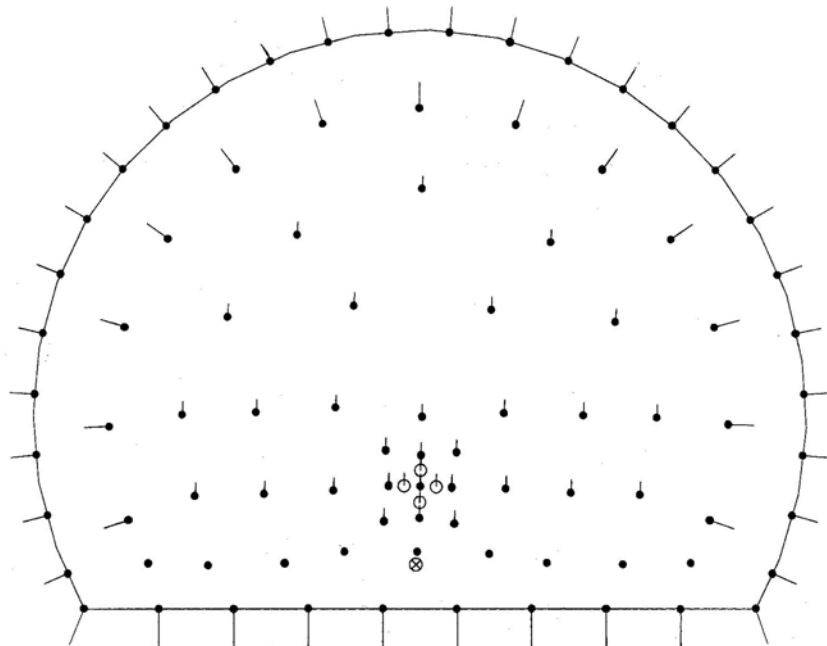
Drilling pattern for 45 and 64 mm drill hole diameter.
